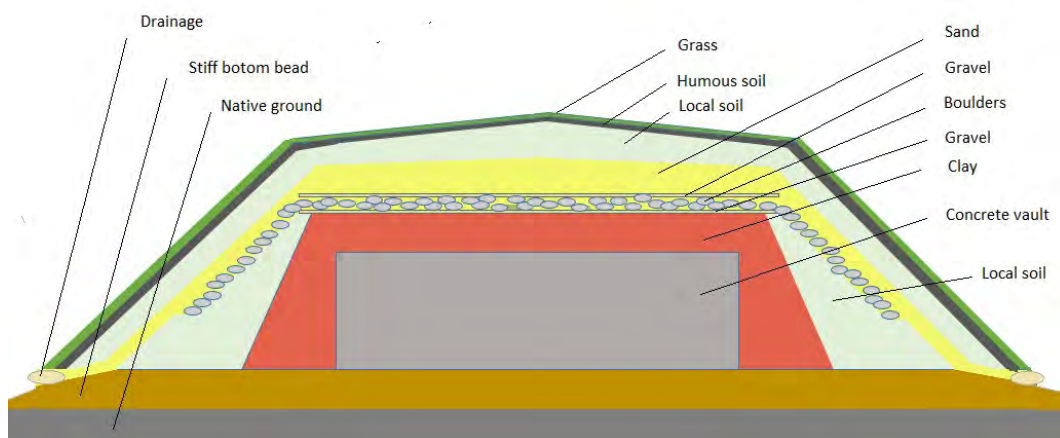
Conceptual design of NSDF: cross section of closed concrete vault and the main engineered barriers of the multilayer capping system
